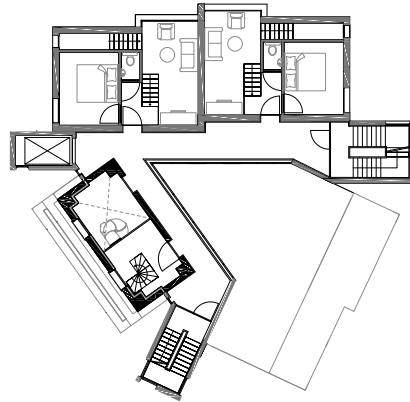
Eight floor, scaled to fit - playroom, type B apartment
